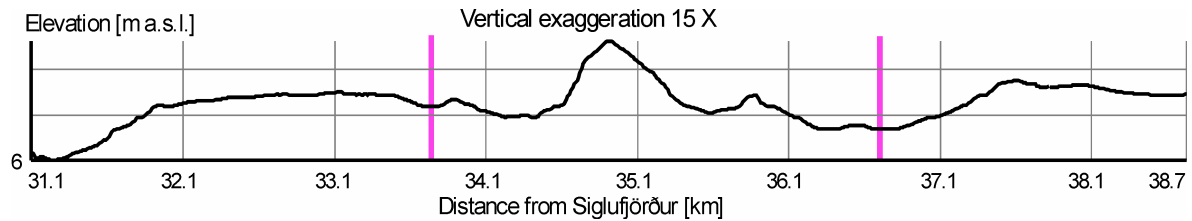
Areas of flooding hazard in road section 941: km 31.1-38.7 – pipe 510 to crossroads to Straumnes
